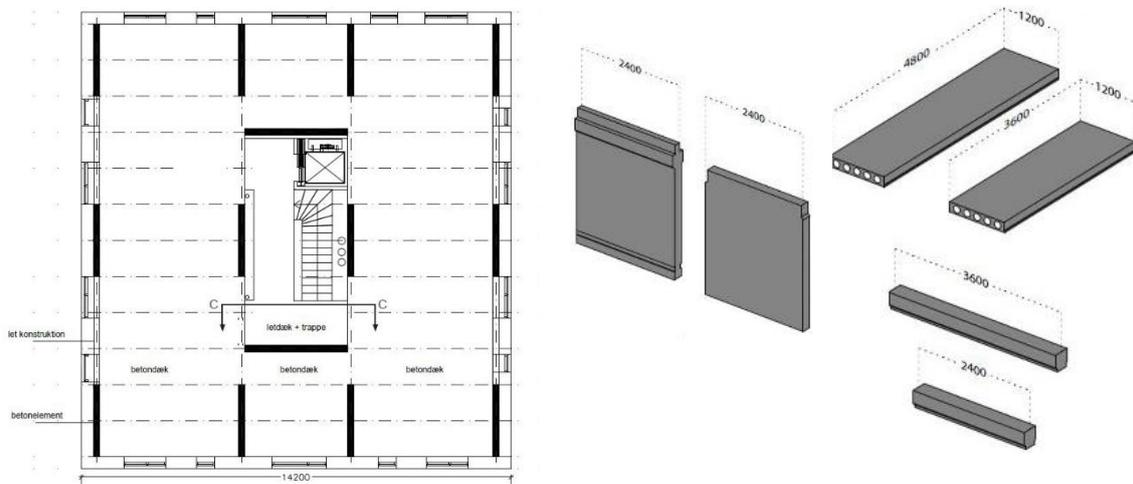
Circle House. Plan of structure and concrete modules. The structural system consists in 3 module types with 2 sizes for type (structural walls, slabs and beams) (Source: Vandkusnten 2017s).
